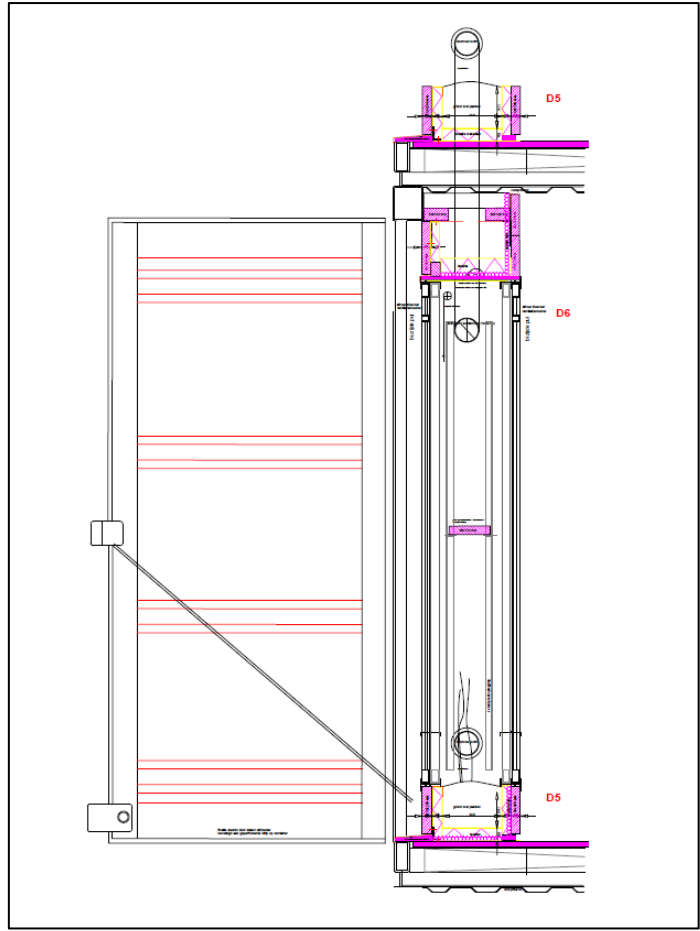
Vertical section of one of the façade modules Source: (Door Architecten, 2018)
